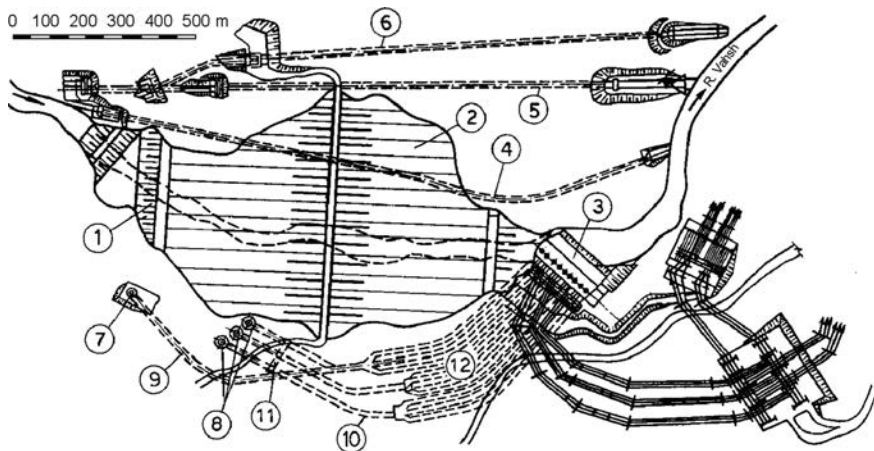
Locality plan of the structures of the *Nurek* hydraulic scheme (Tajikistan). (1) Cofferdam; (2) dam; (3) powerhouse; (4, 5) diversion tunnels; (6) overflow tunnel; (7) temporary intake; (8) permanent intakes; (9) supply tunnel for the first-commissioned generating sets; (10) supply tunnels; (11) space for emergency-overhaul gates or valves; (12) supply conduits for the turbines.
